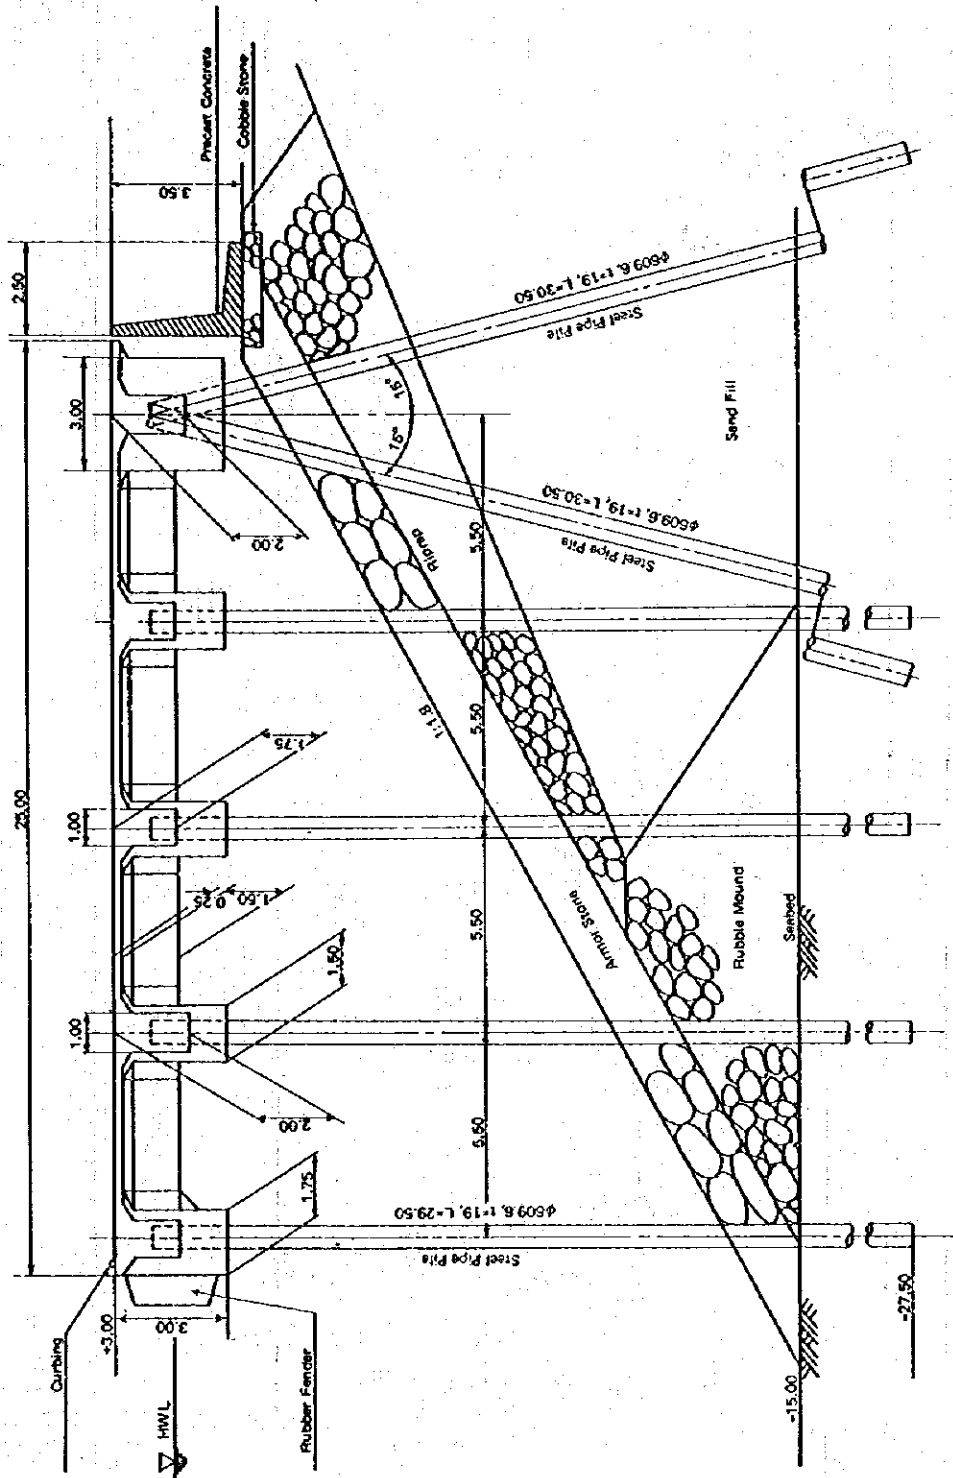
Typical Cross Section of Berthing Structure (Pile Type)
